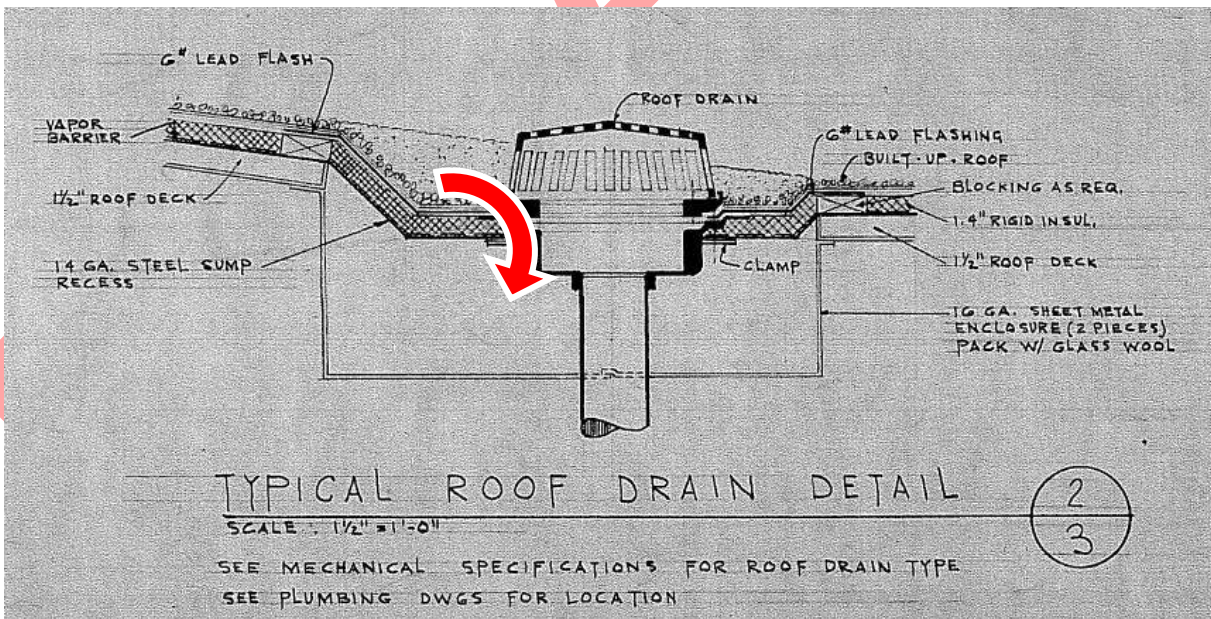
Typical roof drain detail. Taken from Detail 2/3 of the 1968 Drawings.
